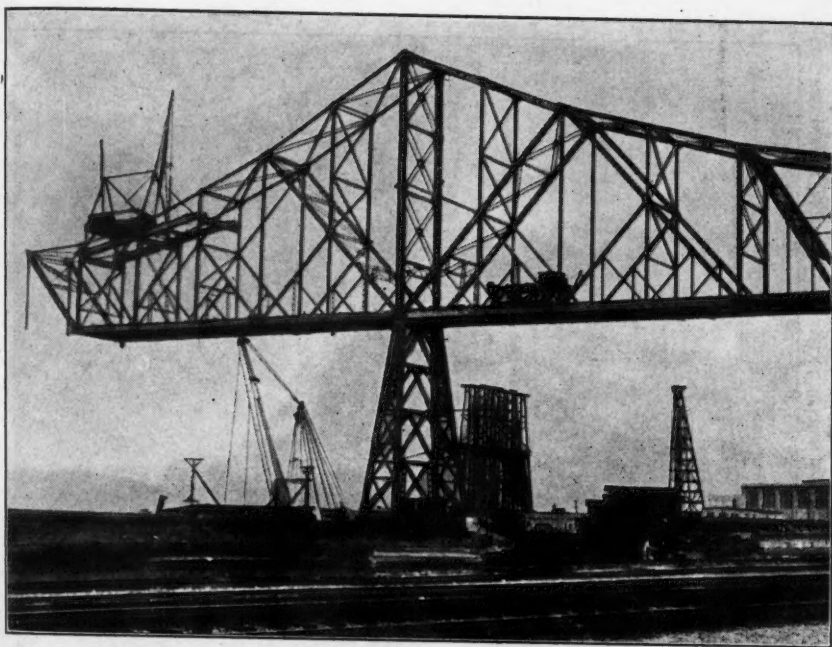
TOP CHORD TWO-BOOM TRAVELER, CANTILEVER ERECTION.
